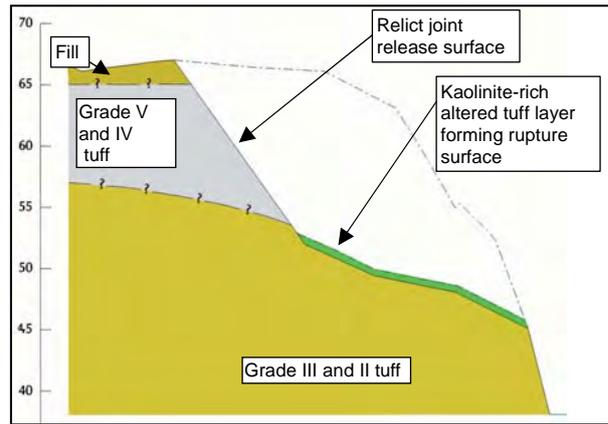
Section through Fei Tsui Road landslide (GEO, 1996b)
